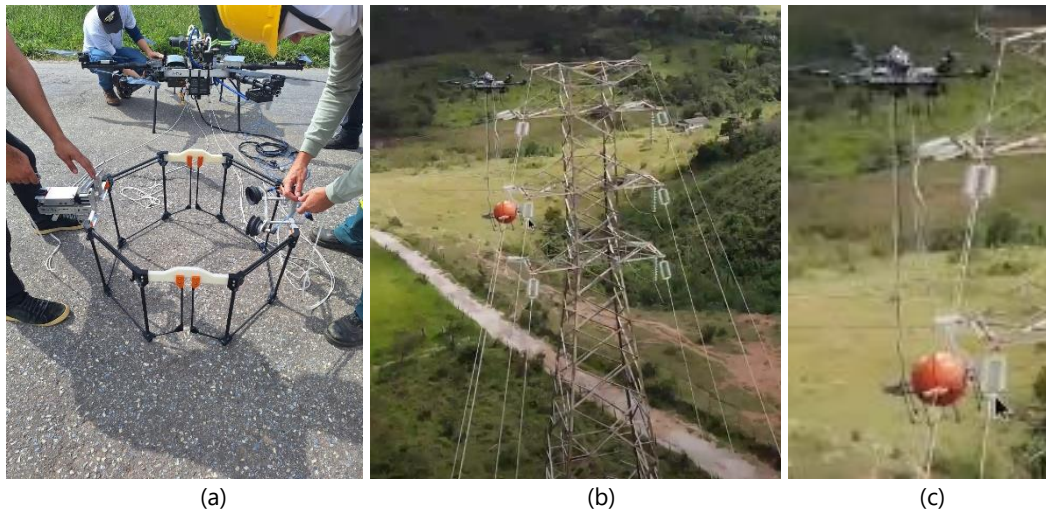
a) View of the second prototype built using 3D printing and carbon tube bars, b) the field test on the 138 kV Overhead Line, and c) the AWM installation mechanism was completed but not completely its enclosure.
